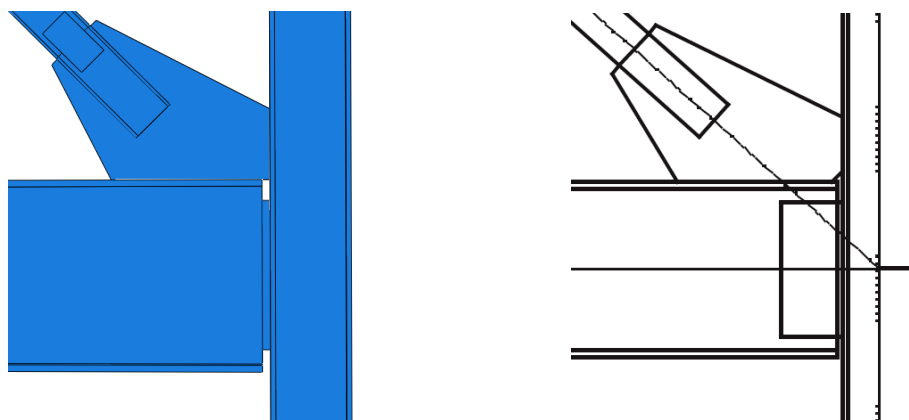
Simulated Connection and Layout of Constructed Connection (Uriz and Mahin, 2008).
